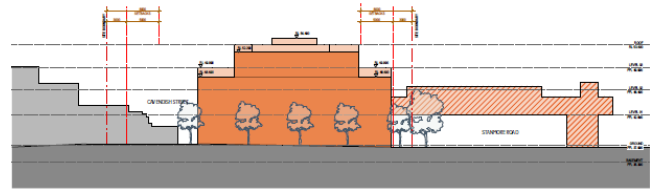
Proposed west elevation (massing only) of Concordia Building.
